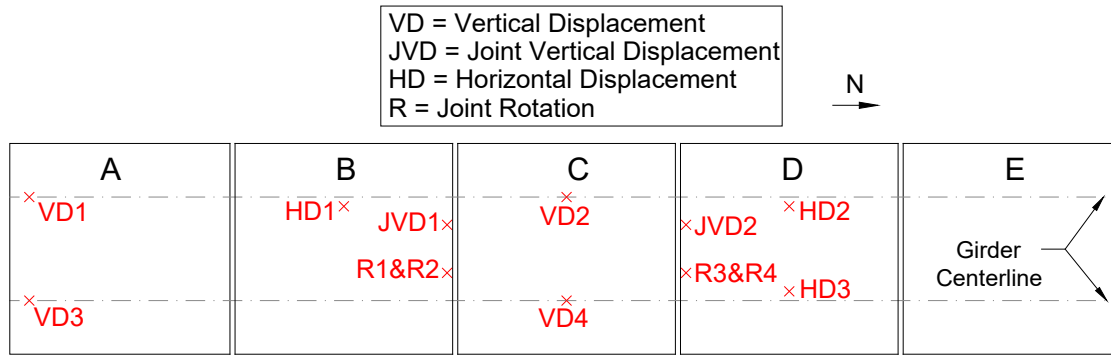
LVDT Installation Plan for the Precast Bridge Specimen
